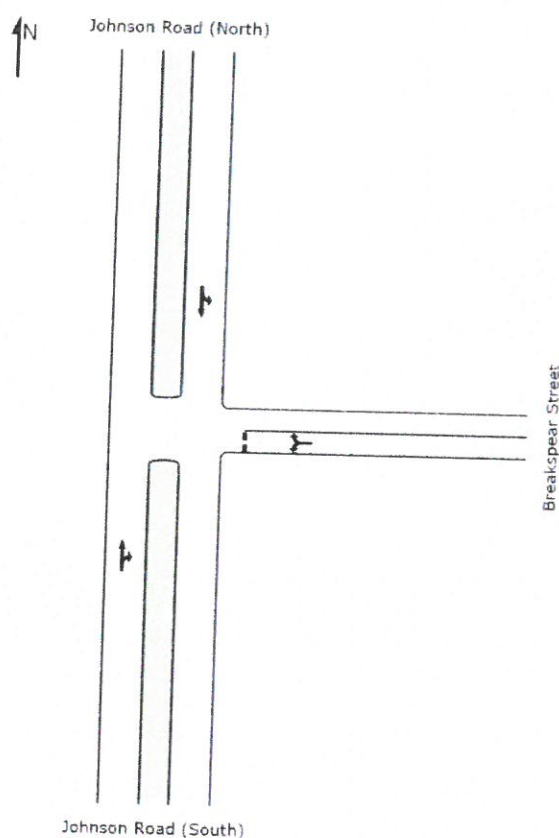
SIDRA representation of the existing Breakspear Street / Johnson Road Intersection.
